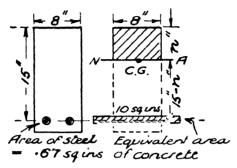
REINFORCED CONCRETE BEAM SECTION.
